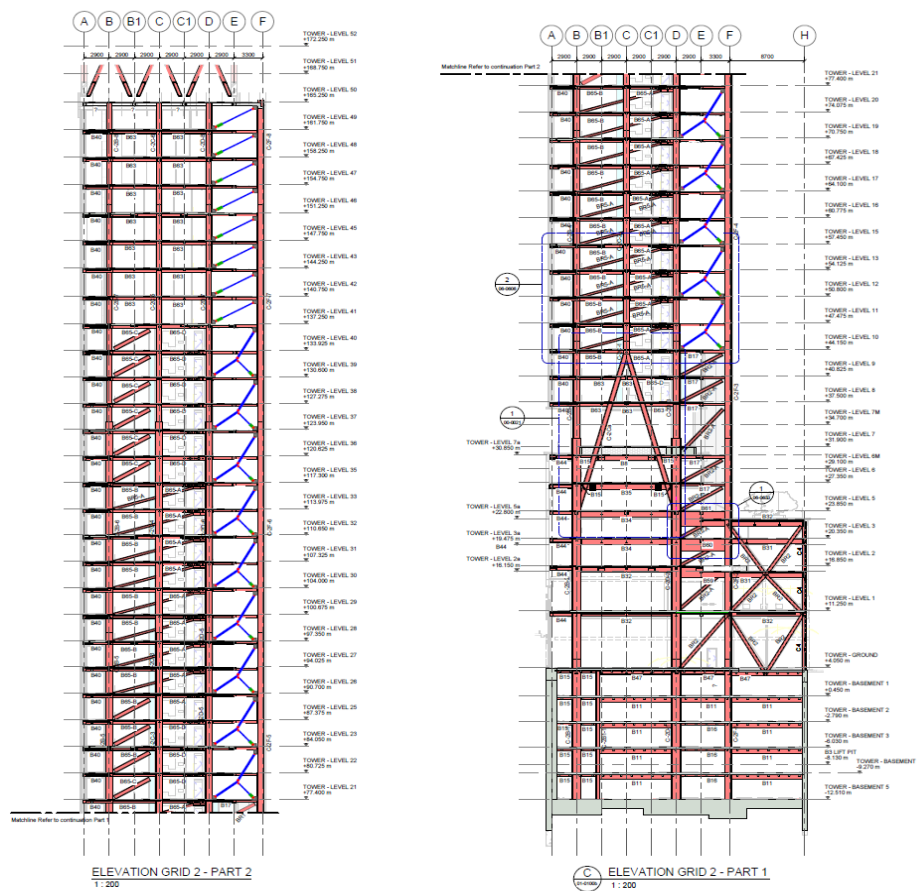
Gridline 2 elevation view for Arrangement II - Damper braces in blue lines
